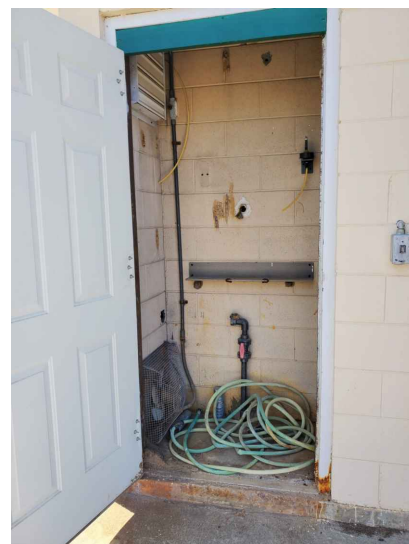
LOOKING WEST TOWARD CHLORINE GAS ROOM
